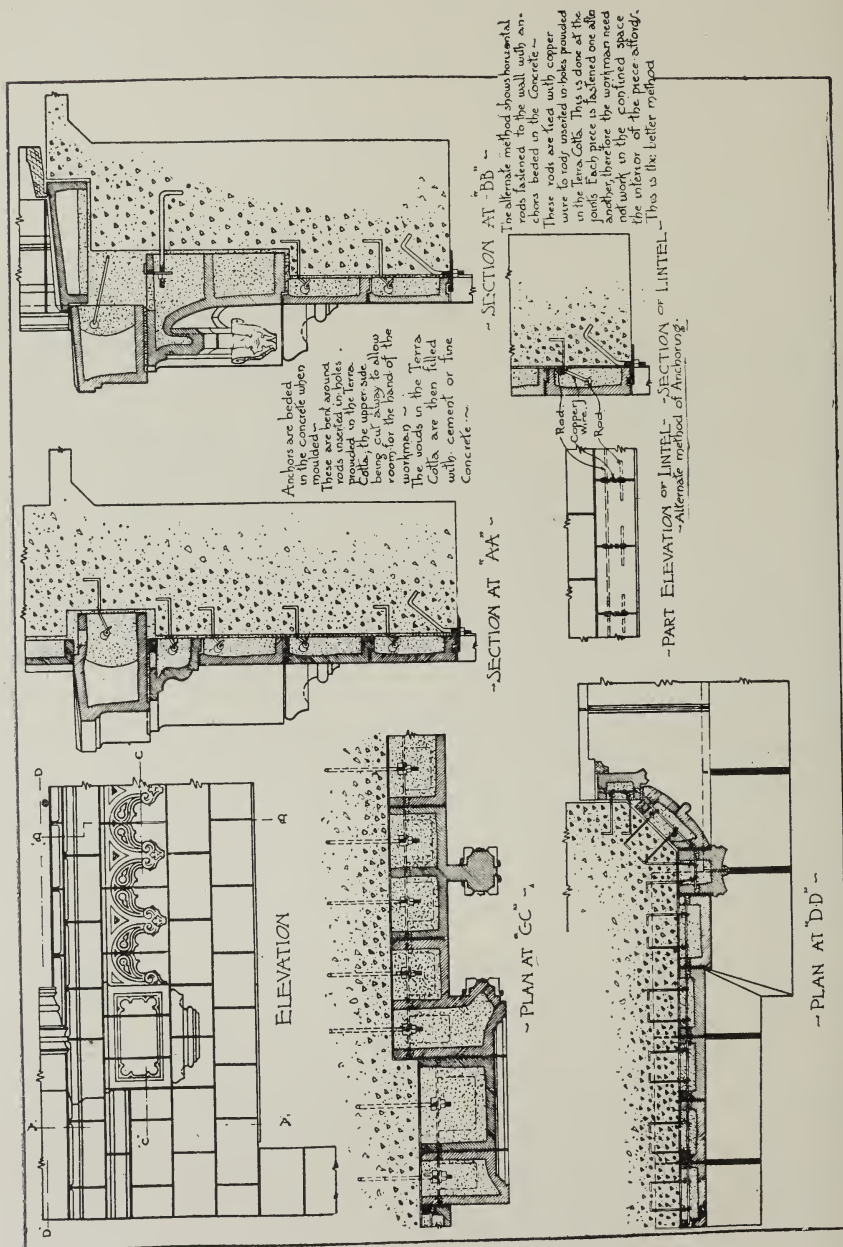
Terra-cotta Facing for Reinforced Concrete Walls.
